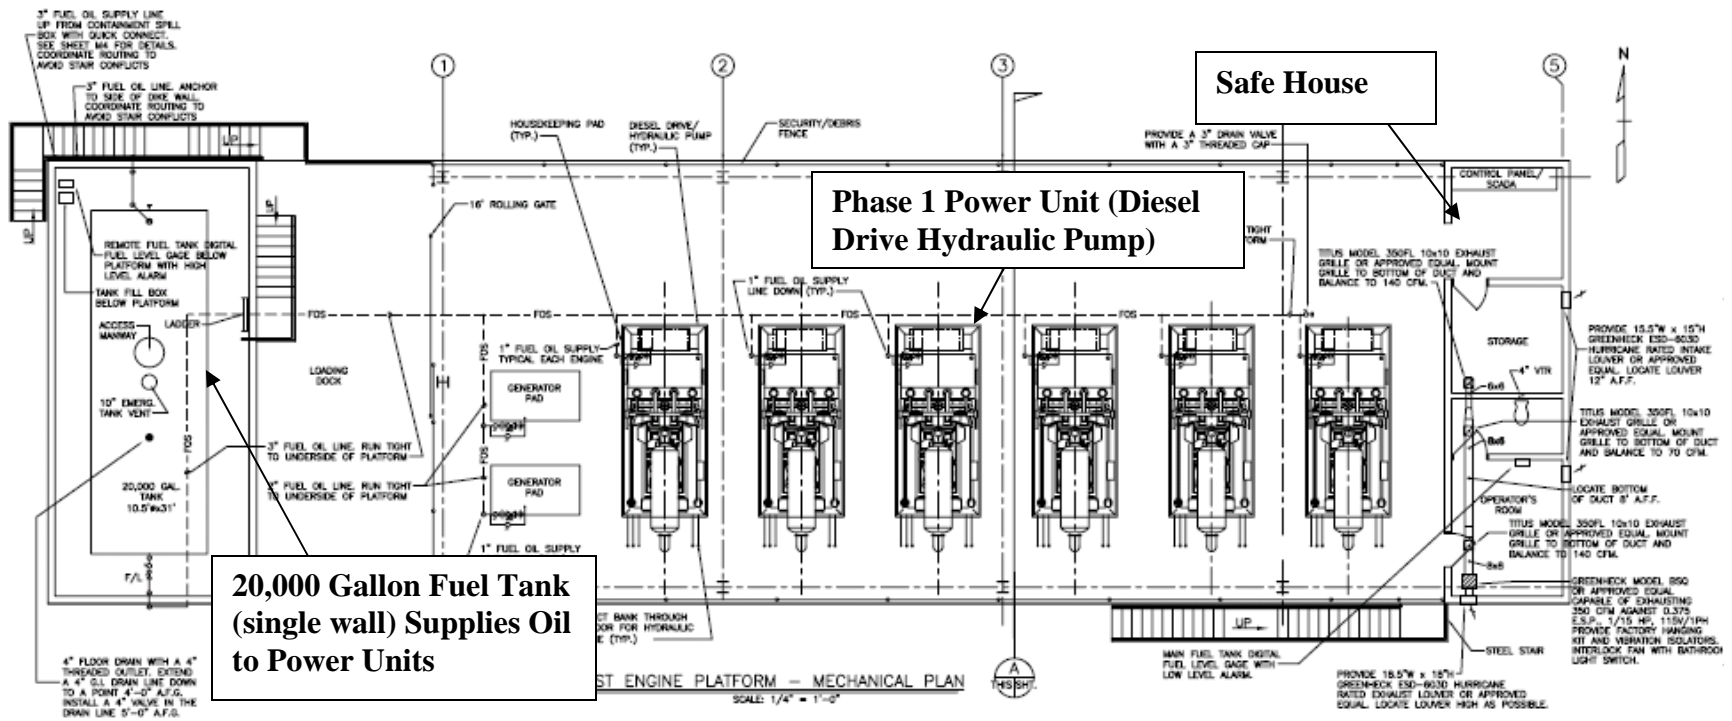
17th Street West Engineer Phase 1 Platform Plan
